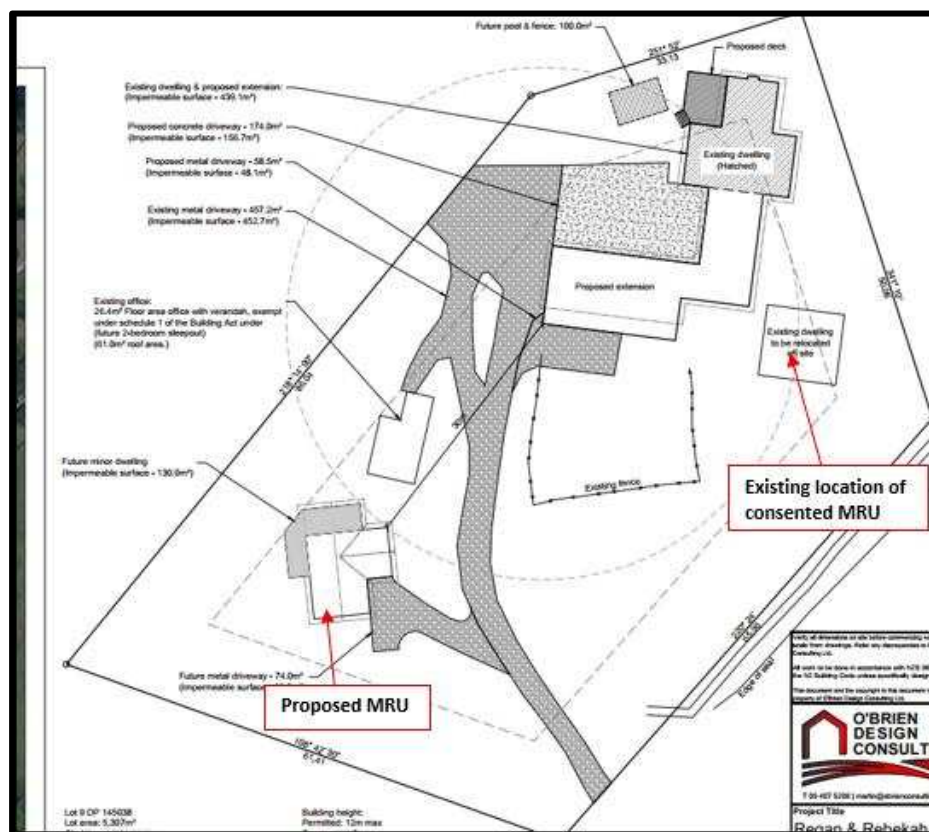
Snip of the site plan showing location of the existing and proposed MRU.
